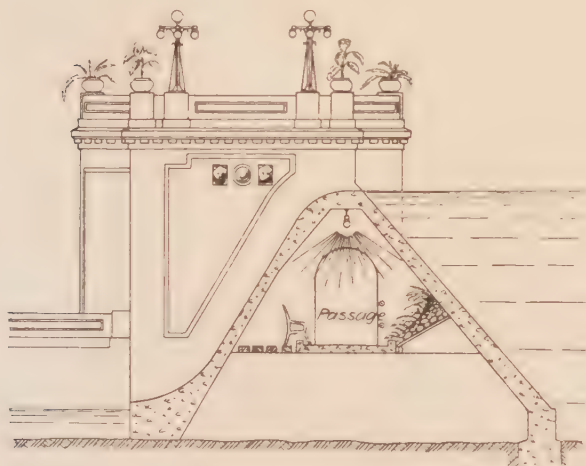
Section of Ferro-Concrete Dam in Pleasure Park.
